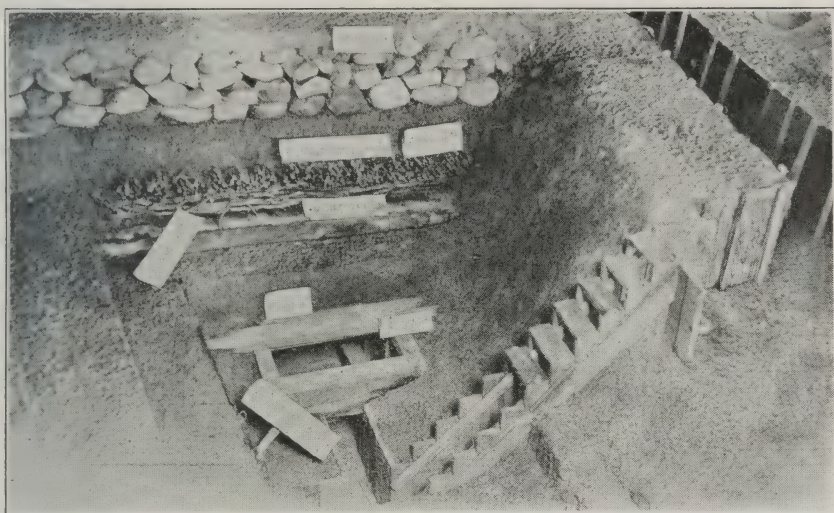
Cut and Cover Shelter. German sandwich roof. Cover: 6 inches earth, 2 feet rock, 18 inches earth, double layer fascines, steel rails, 2 feet earth, heavy timber.
